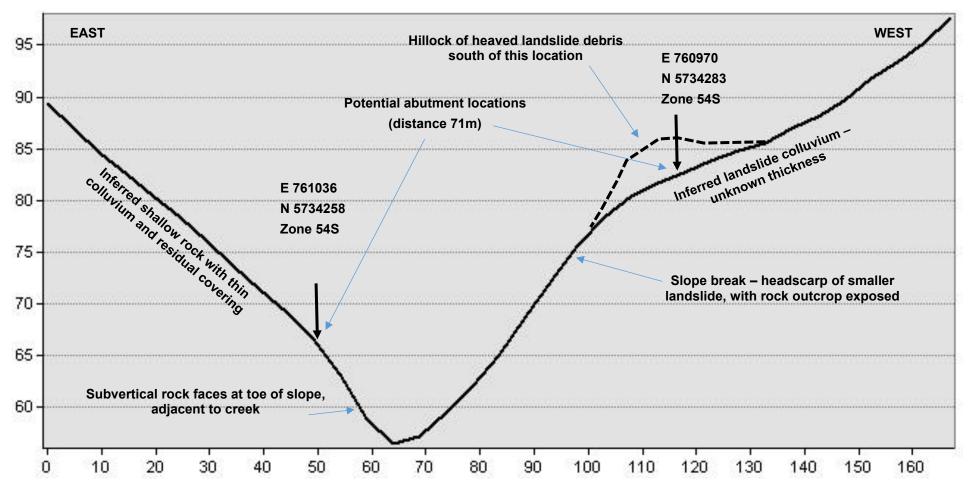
Terrain cross section at the potential Bridge 2 abutment location, looking south (axes in m)
